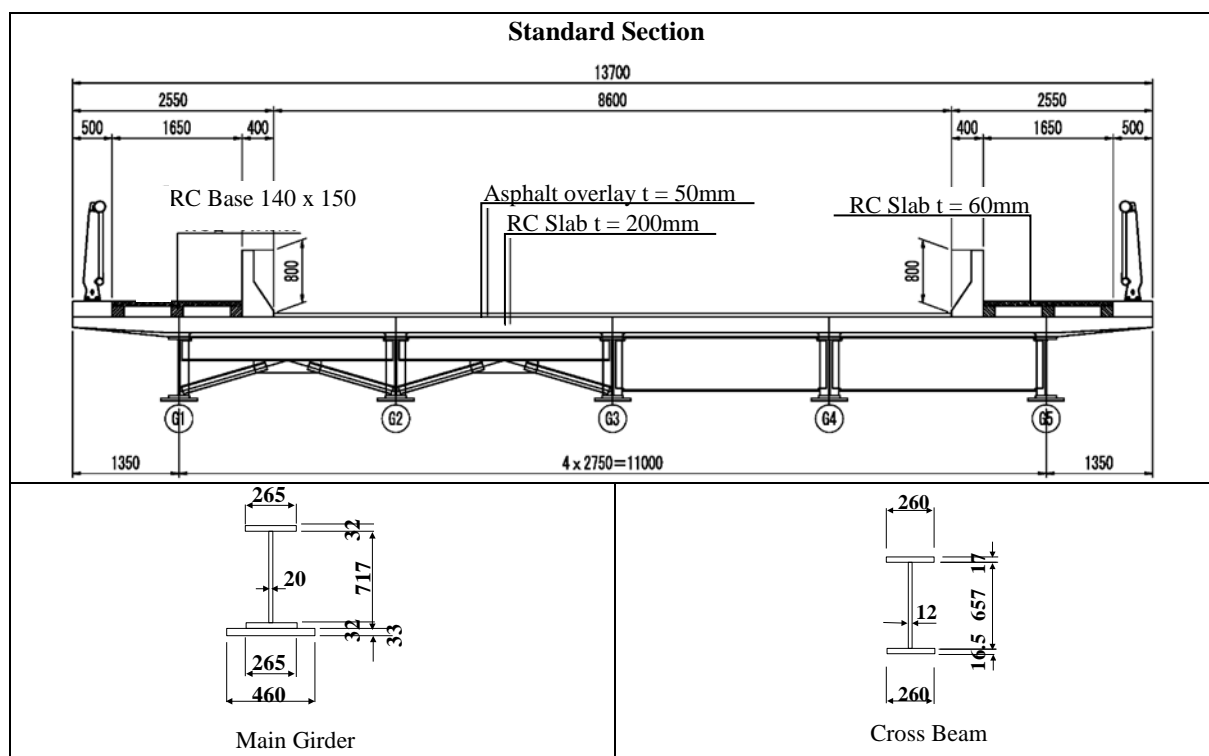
Measurement of Existing New Mataniko Bridge
